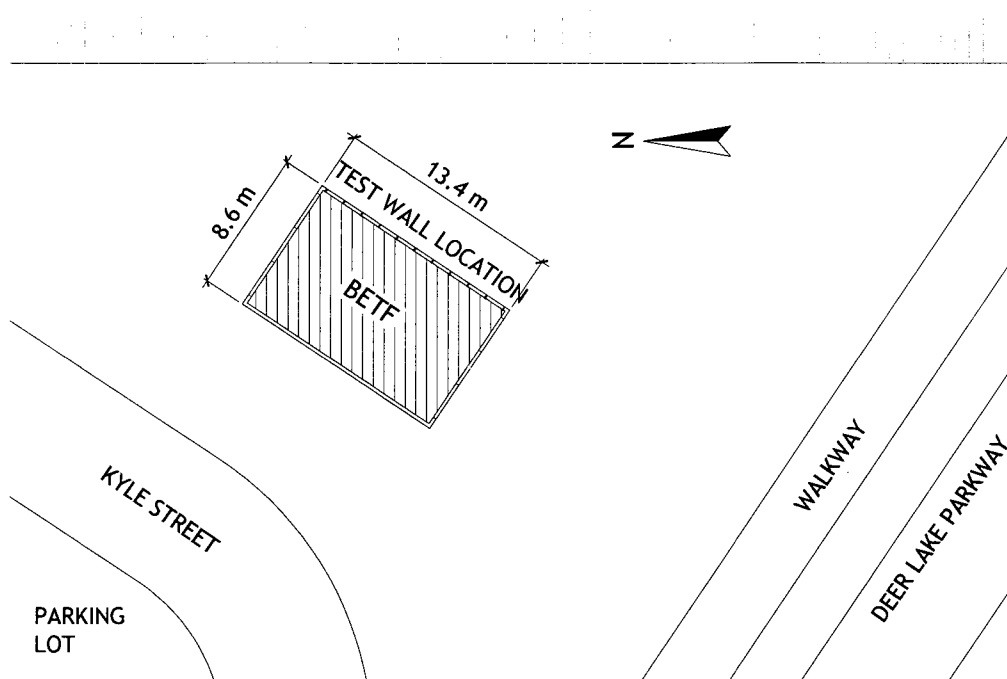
Site plan of the Building Envelope Test Facility (BETF) at the Burnaby campus of BCIT.
